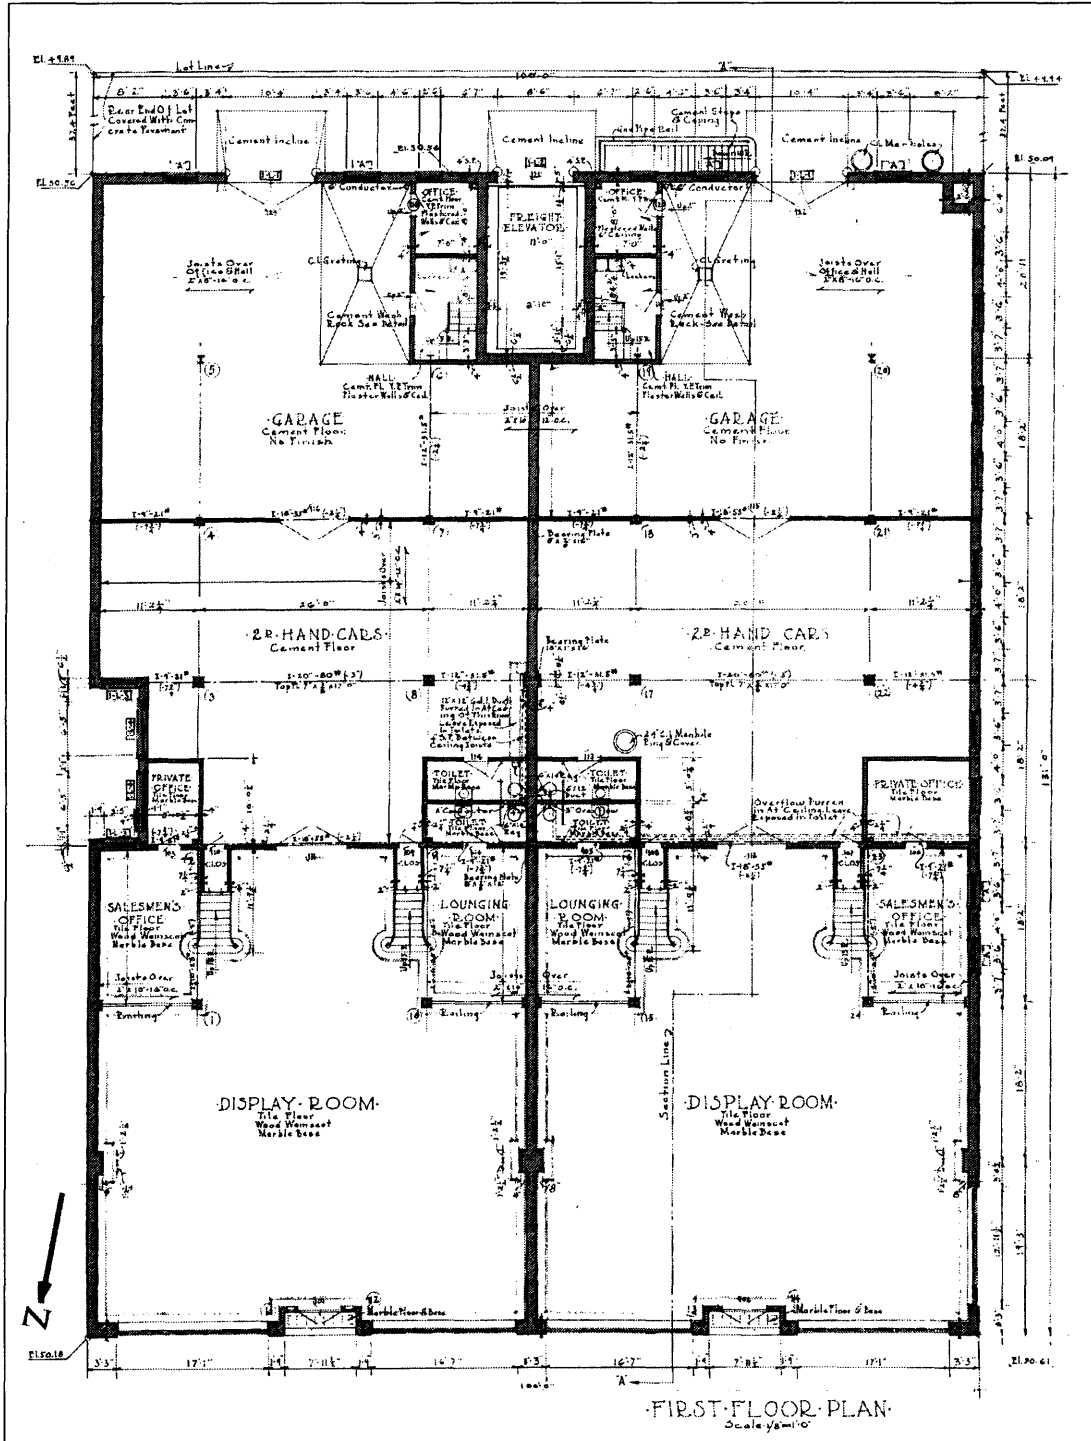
Historic first floor plan (Proudfoot, Bird & Rawson, architects, 1916)
